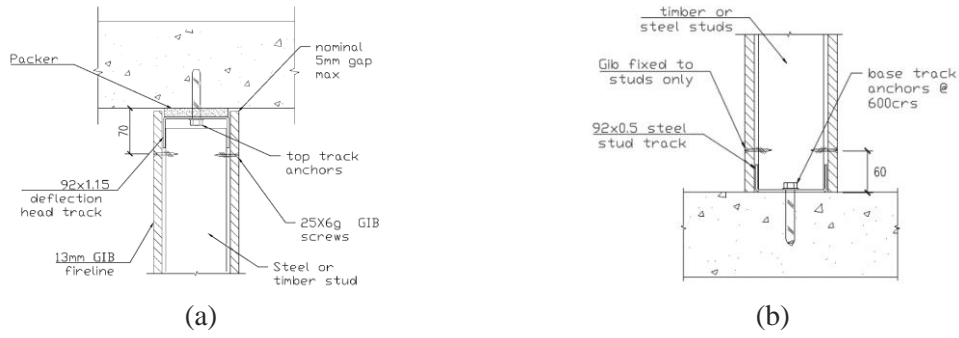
(a) Top slab to track connection (b) Bottom slab to track connection.
